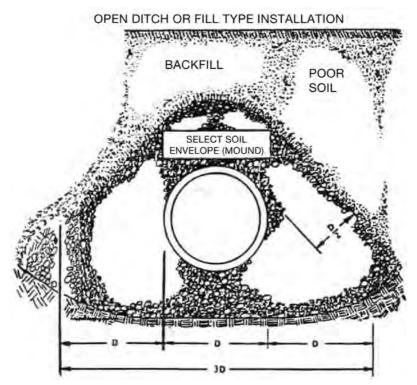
Minimum Embedment Width When Native Soil Can Not Sustain a Vertical Cut or When Installed in the Embankment Condition
